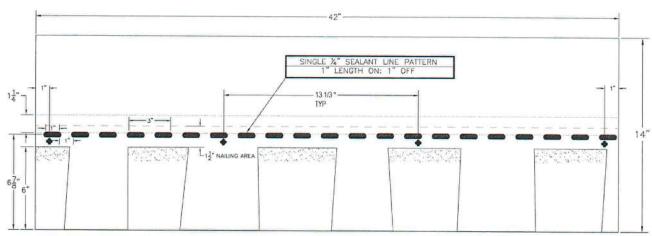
ProLAM™ Architectural Shingle 4 Nail Pattern (non-HVHZ only)
